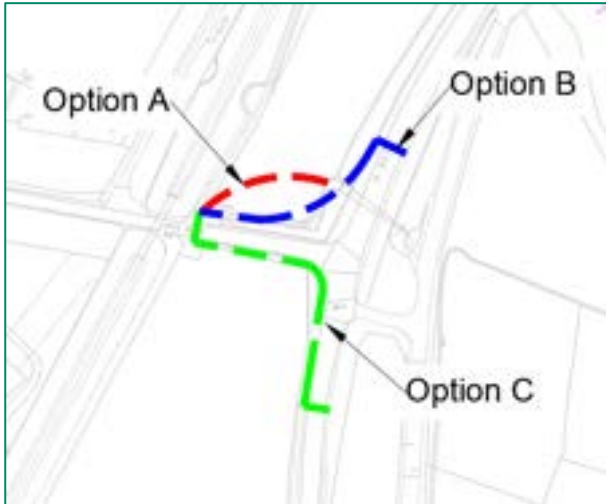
Outline Improvement Options to facilitate F&B Way access
